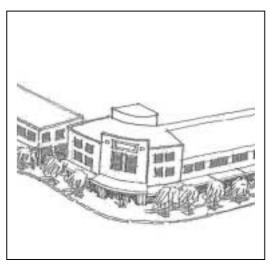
Unacceptable. The corners of buildings must be designed to highlight and strengthen.
